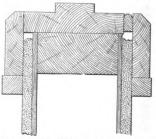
Showing How Bead Is Applied to Edge of Jamb.
